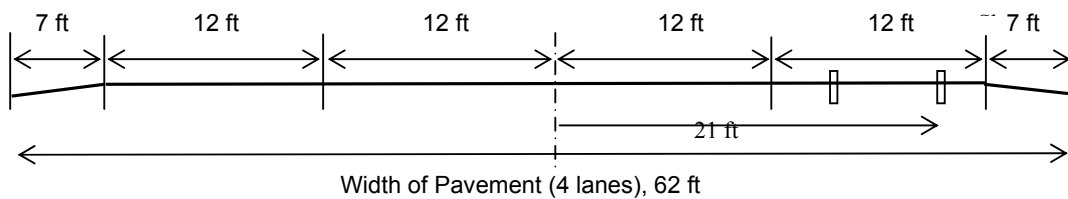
Dimension of Cross Section of the Pavement for the Austin Loop 1 Site (Main Lane).
